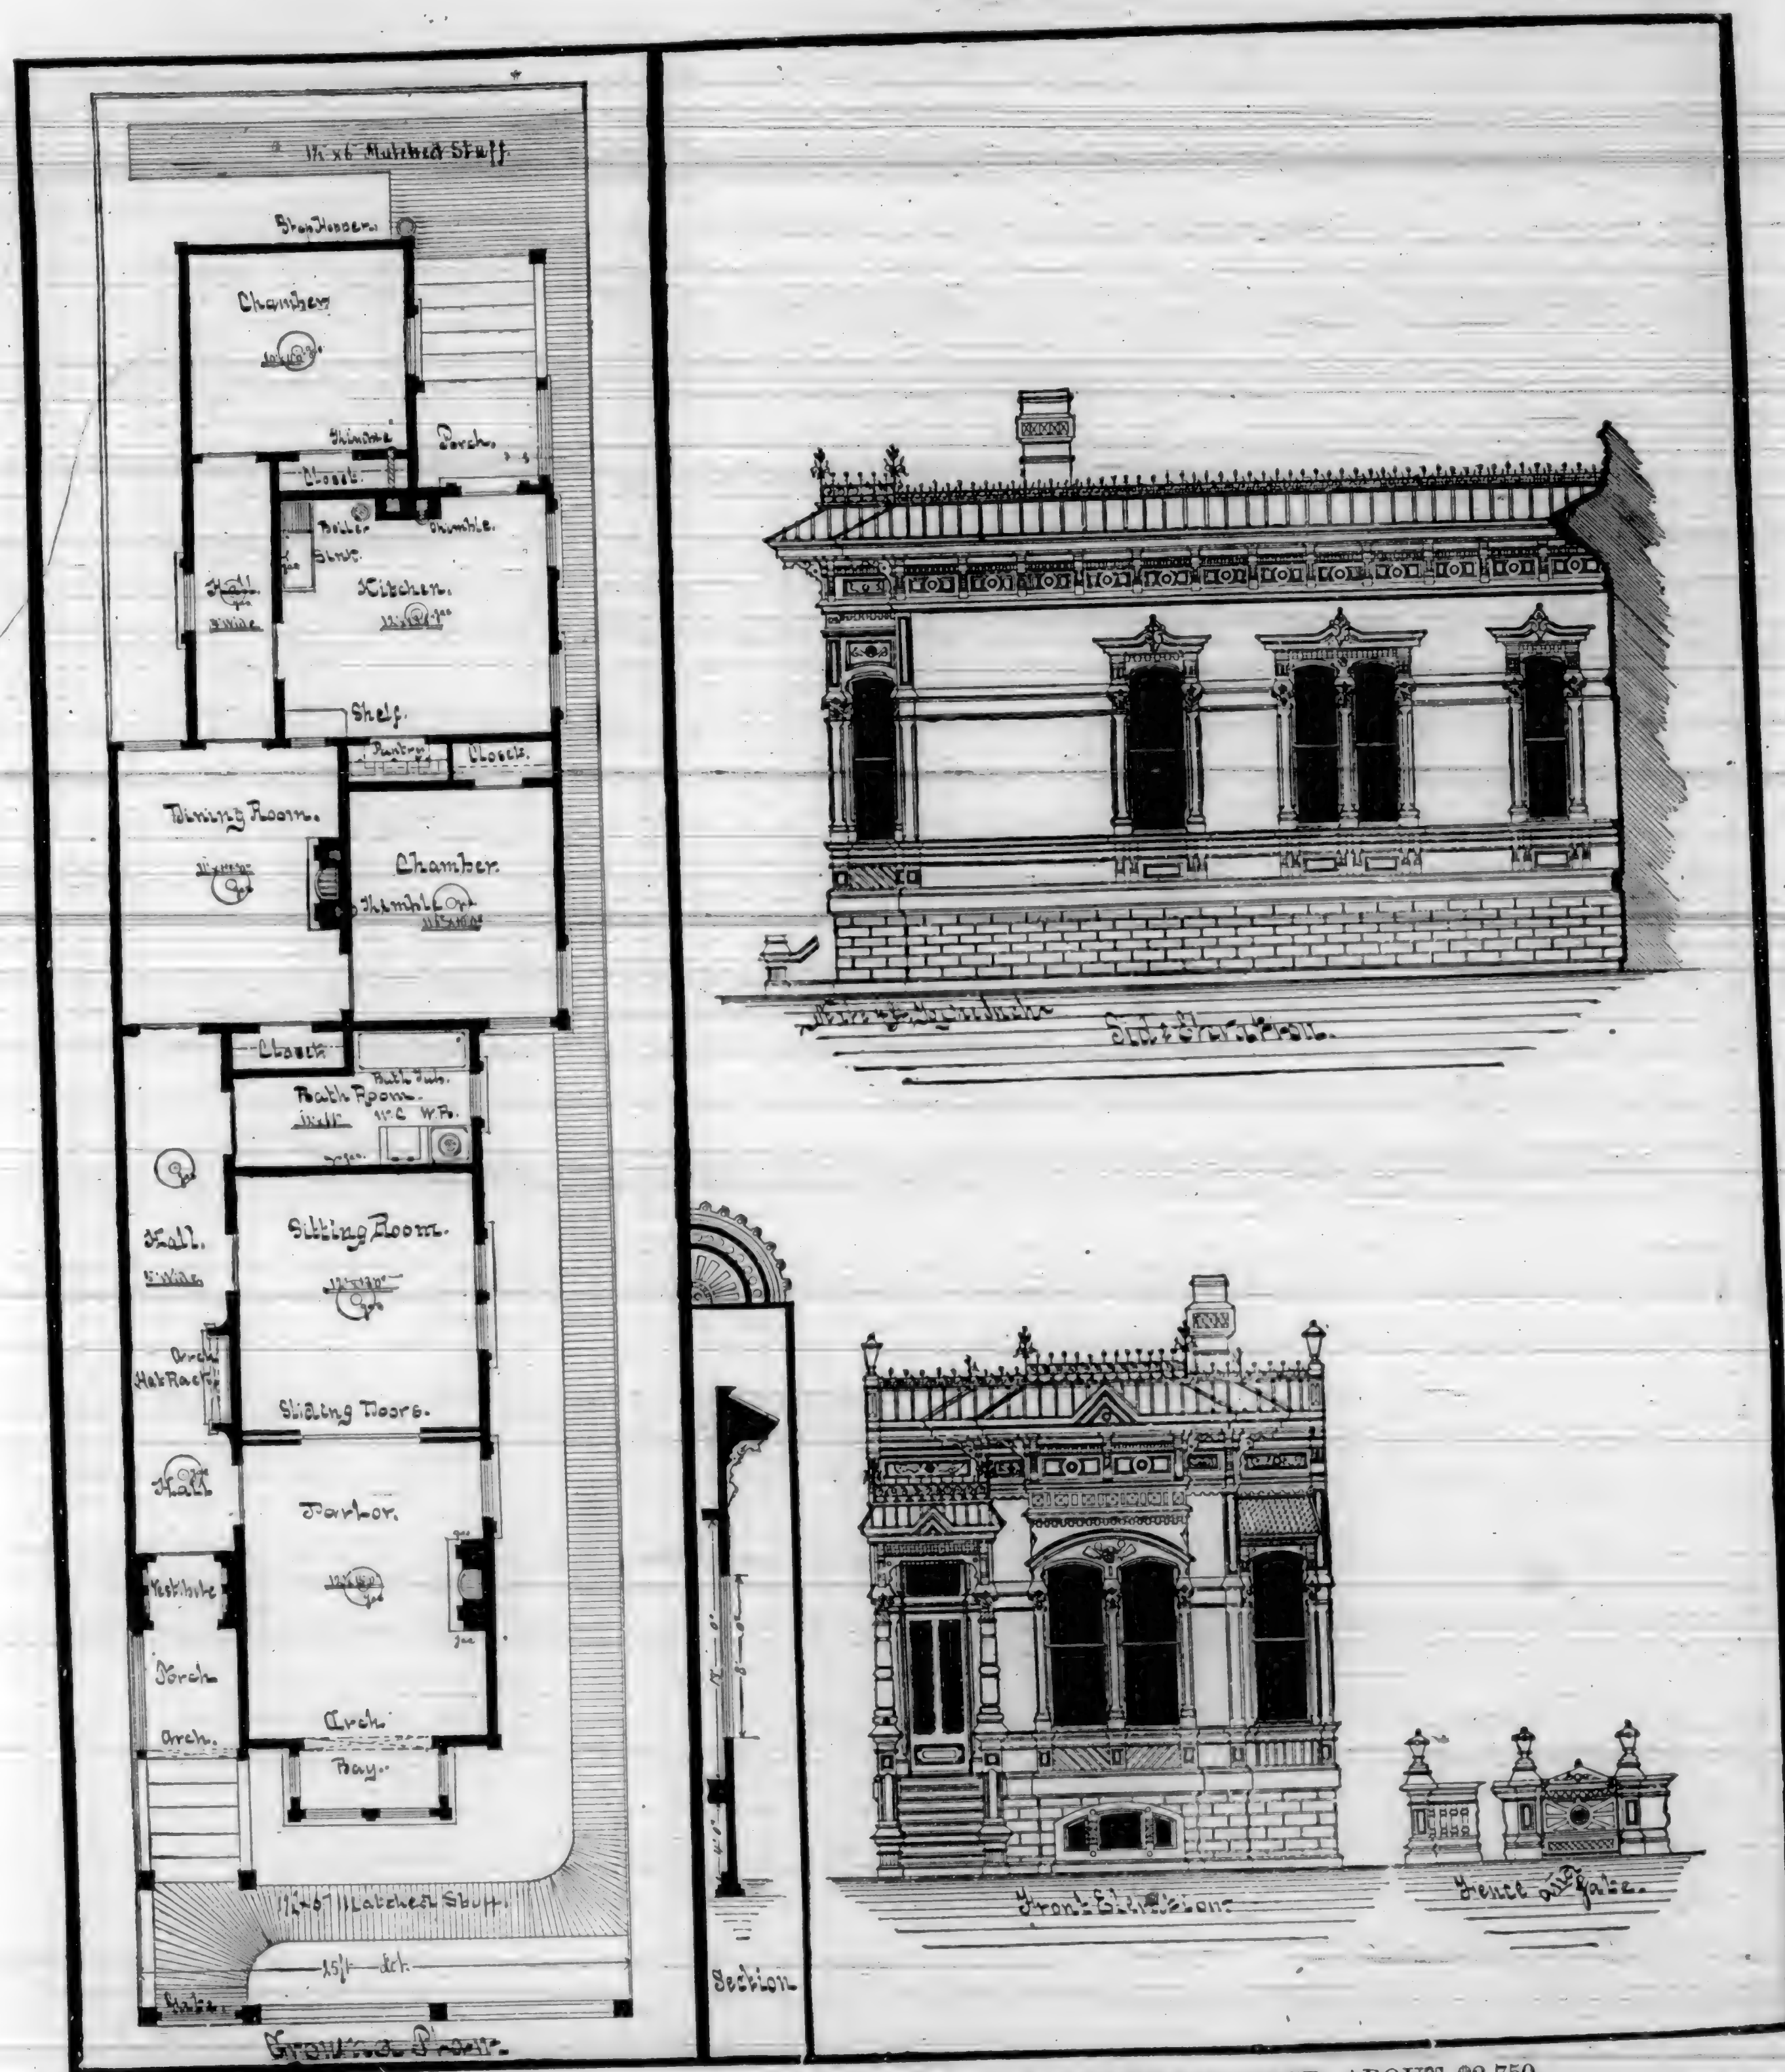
ELEVATION AND PLAN OF ONE-STORY DWELLING. COST, ABOUT \$2,750.
